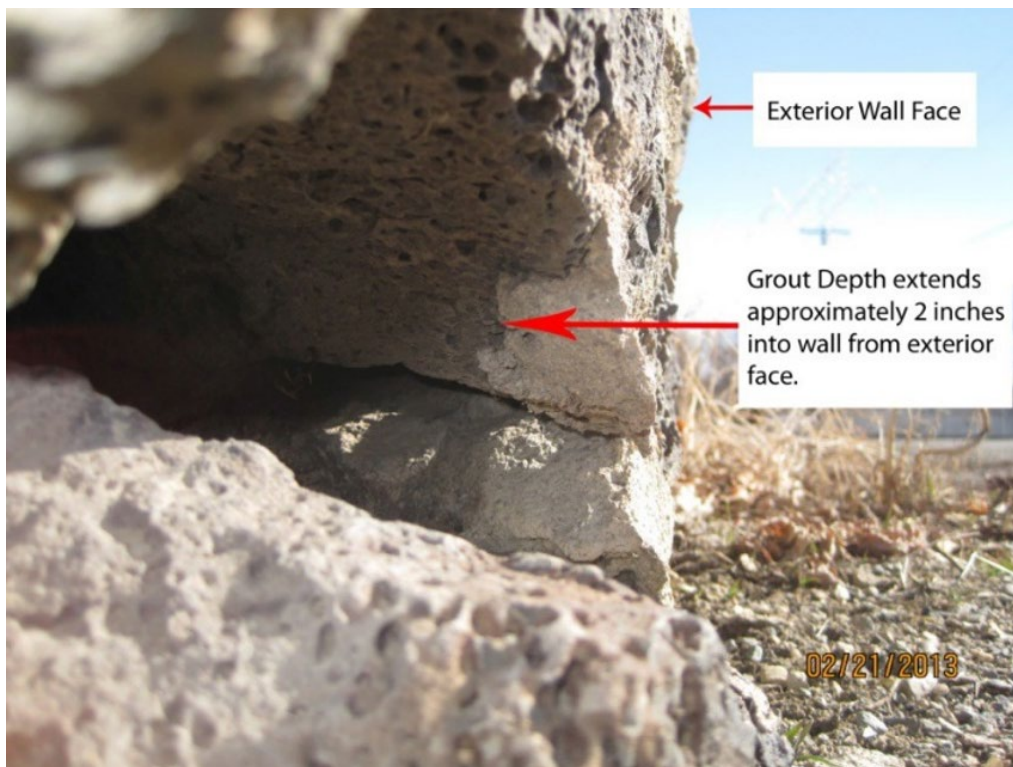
A Section of the Channel Wall Depicting Limited/Shallow Grout
